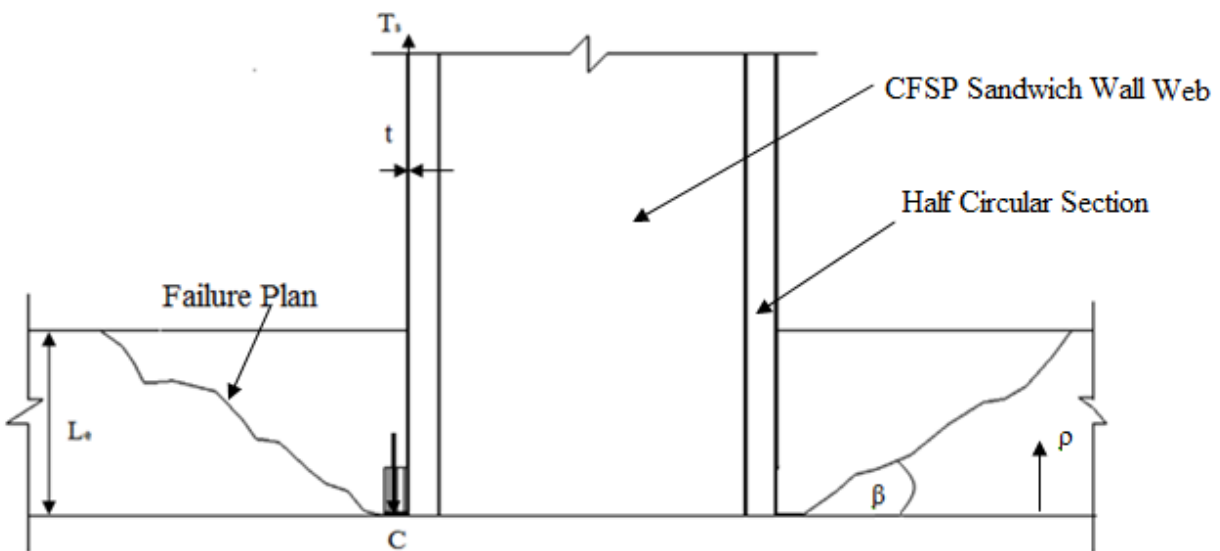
Proposed Concrete Fracture Surface in Foundation
